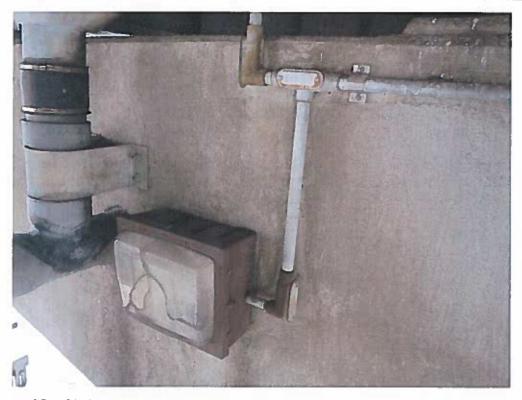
CRACKED LENS FOR LIGHT ATTACHED TO PIER 2. NOTE RUST ON CONDUIT.
